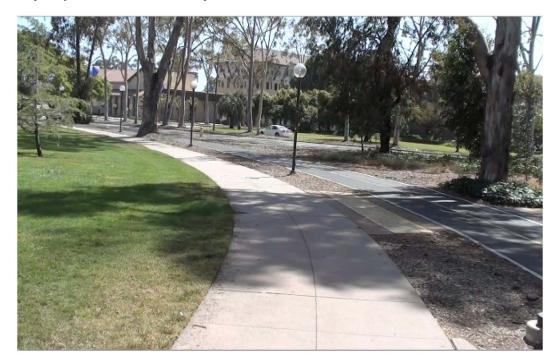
Separate Walking, Bicycling and Auto Facilities – UC SANTA BARBARA, CA
